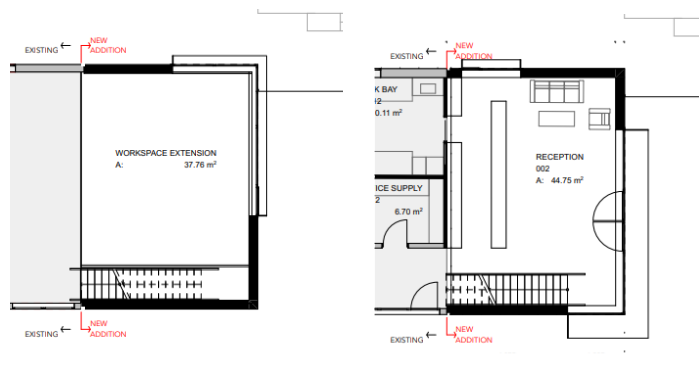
Proposed administration building addition – Ground floor (left) and first floor (right) (Source: Betti&knut architecture)
